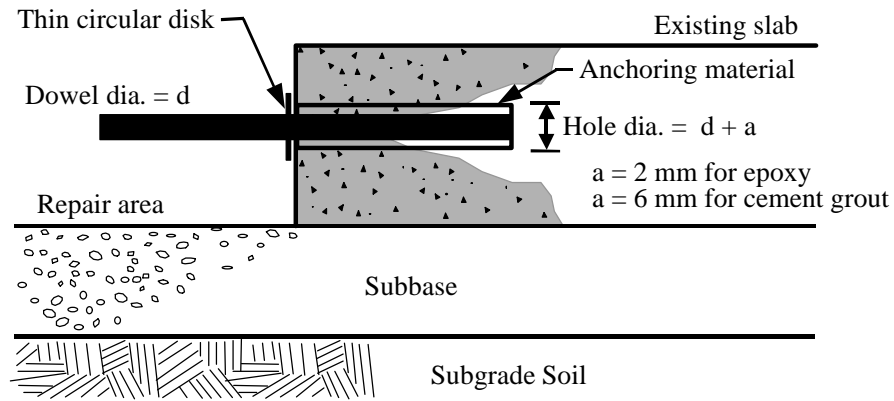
Illustration of dowel bar anchoring in slab face.
